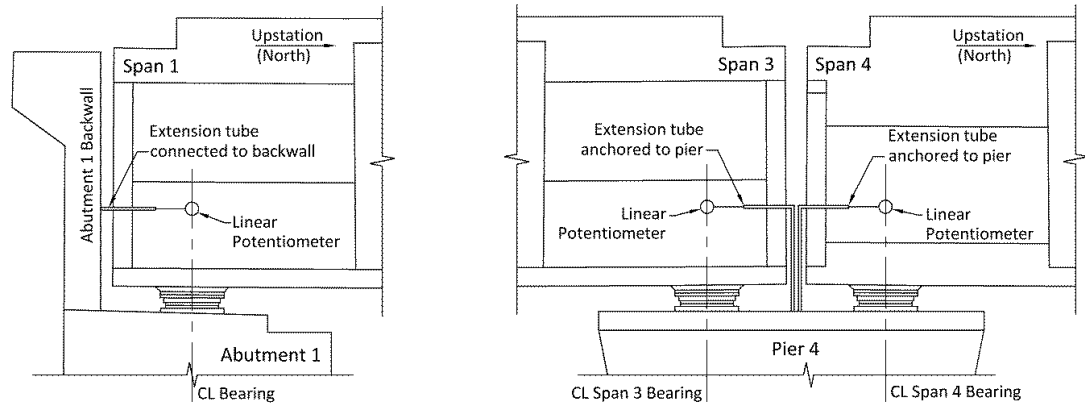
Linear potentiometer layout at the south end of Span 1 and the north end of Span 3 for the southbound bridge looking upstation (i.e., north). Span 1 and Span 3 of northbound bridge are similar, but exterior and interior box are switched.
